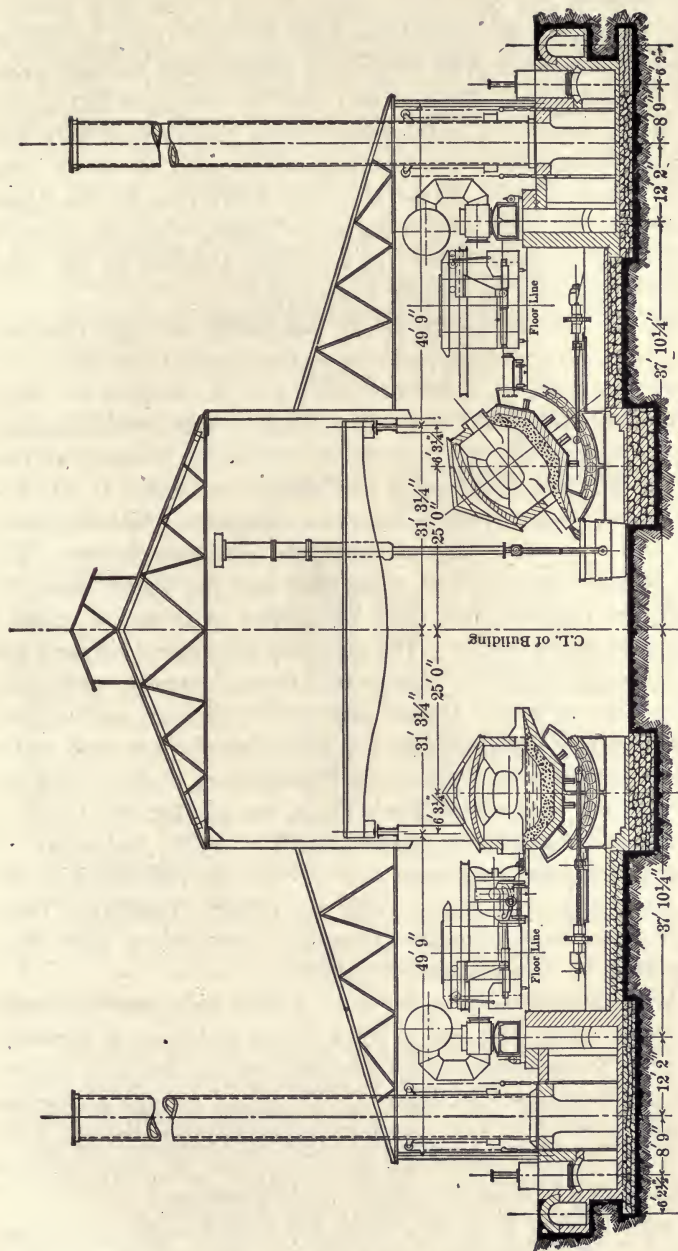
FIG. XXII-L.—CROSS-SECTION OF OPEN-HEARTH PLANT AT STEELTON.
